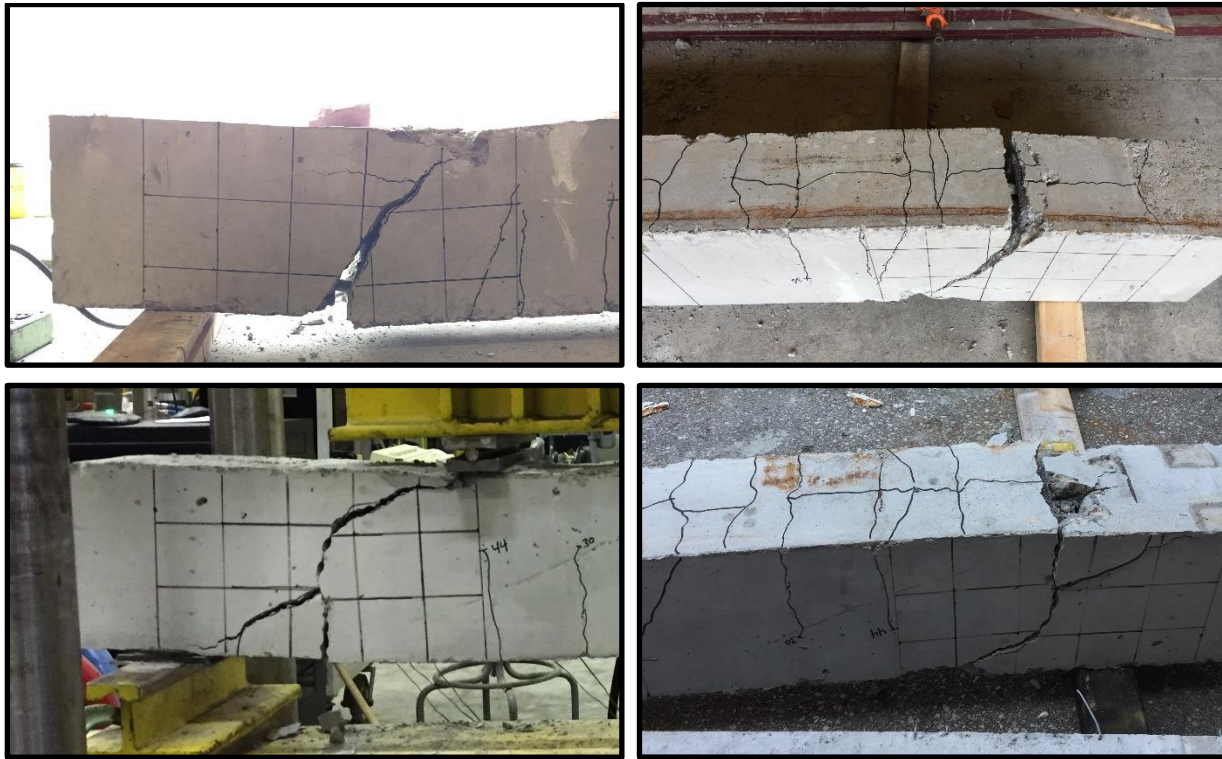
Typical bond failure for non-prestressed beams
